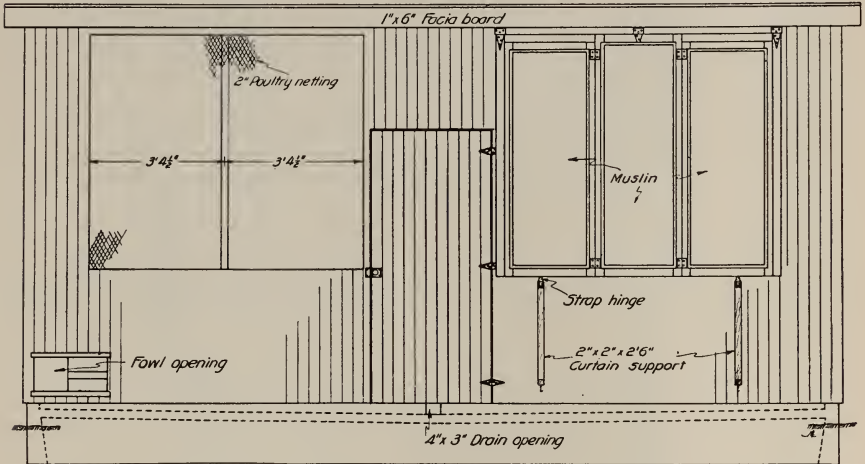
Front view of a 20-foot section of the commercial laying house. For detail plans of curtains, curtain supports, fowl door and front door see figures 25, 6, 11, 17.
